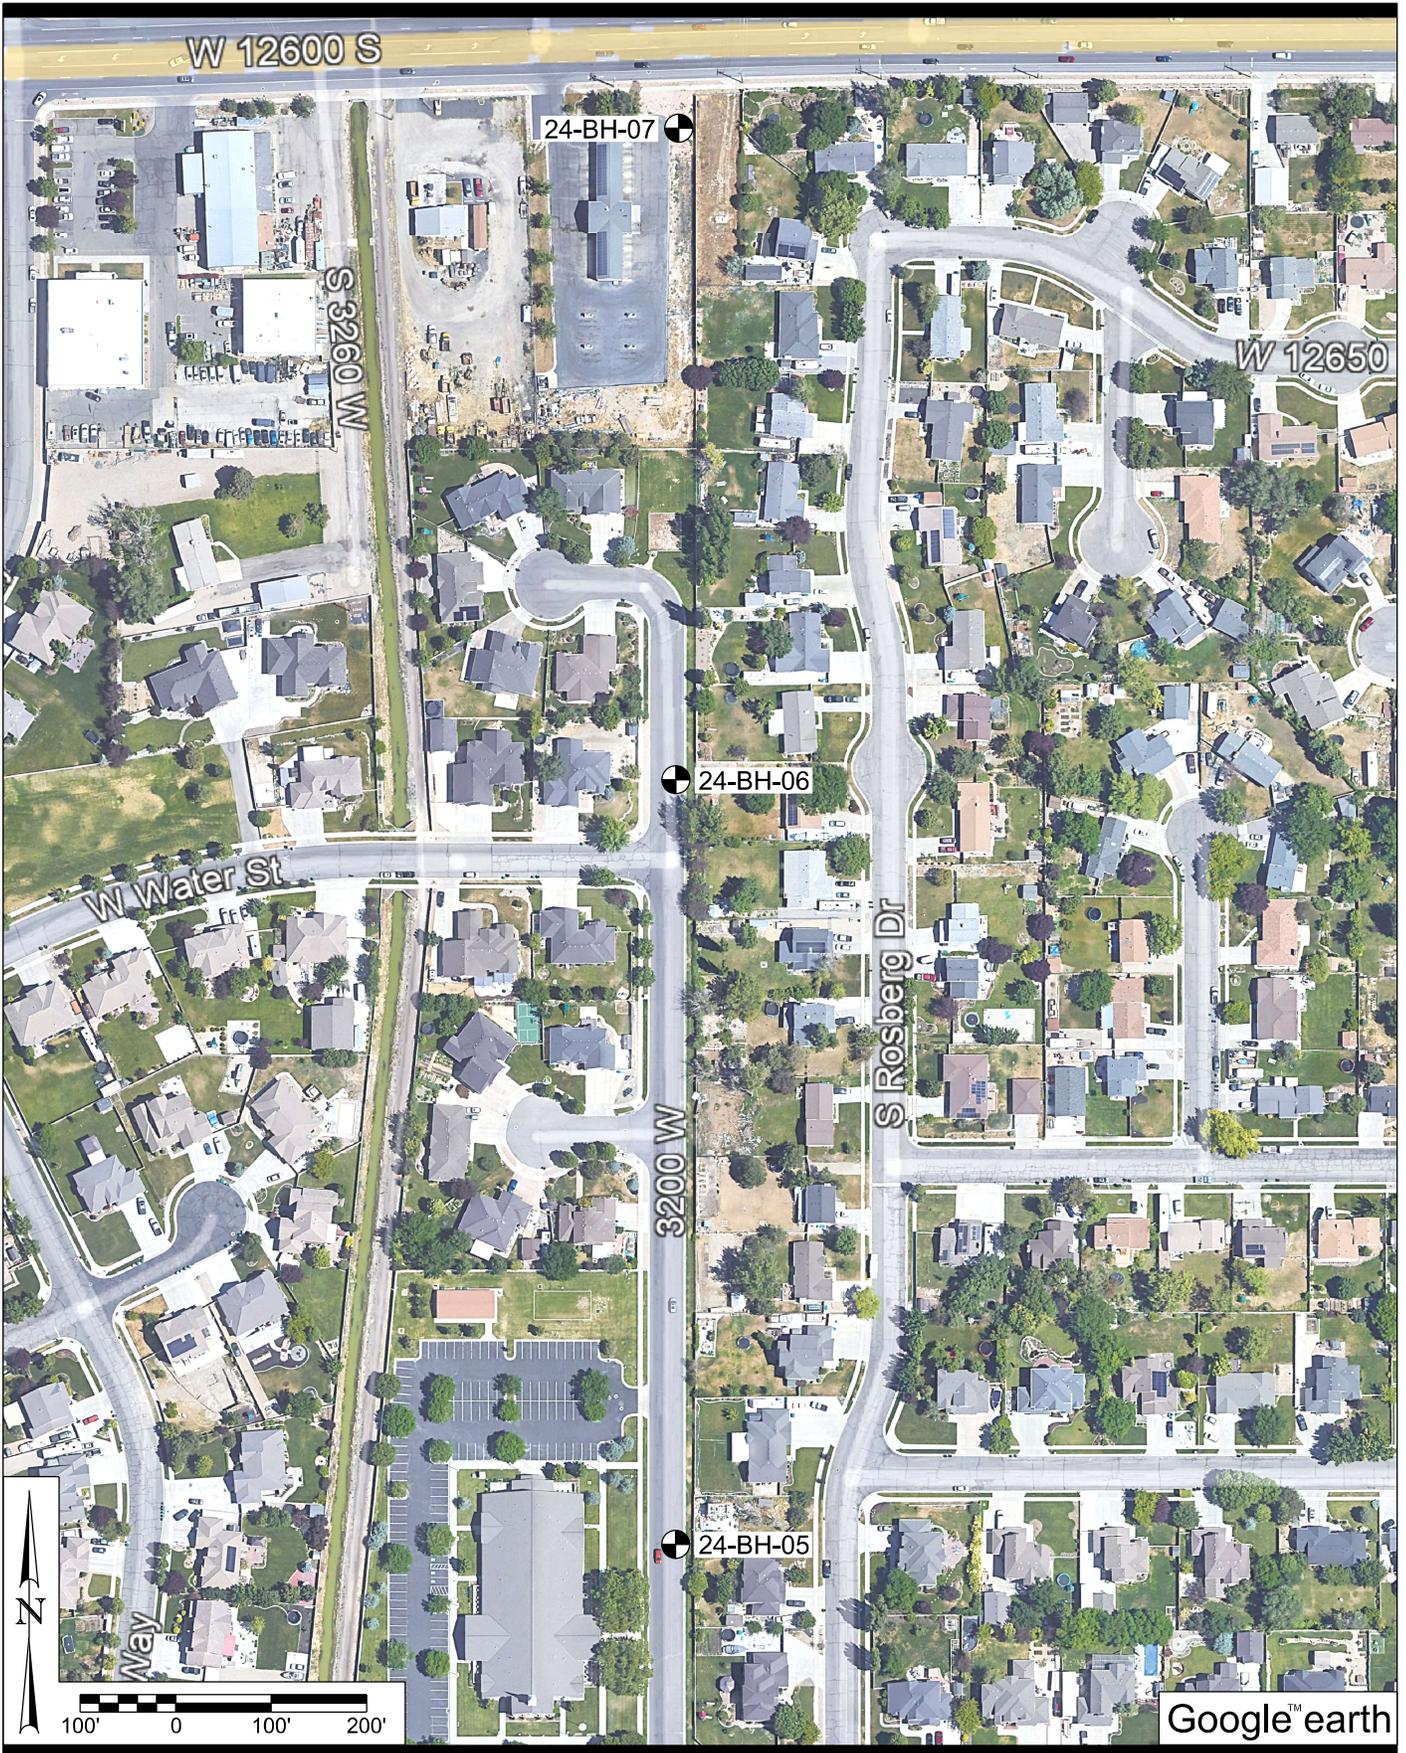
SITE PLAN & TEST HOLE LOCATIONS
